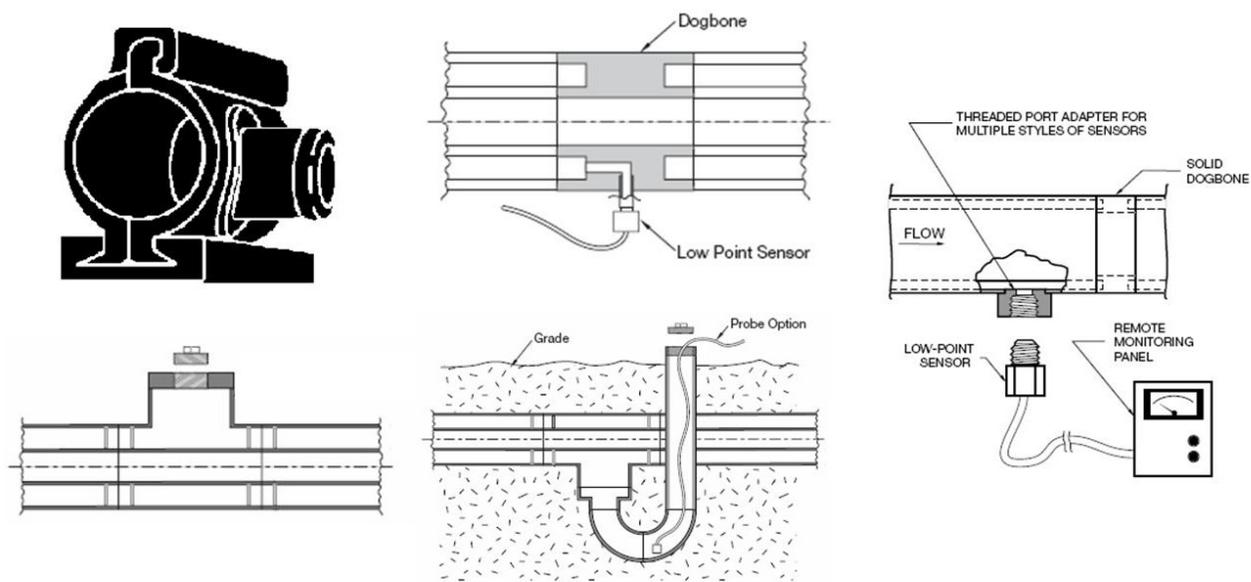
C. Schematics of leak detection arrangements for multi-walled piping systems. Top left: cartoon of a pipe section with a leak detection port protruding from the right; Top centre: attachment for a low point sensor; Bottom left: access tee; Bottom centre: inspection well; Far right: threaded port for single-point detection incorporated into straight piping.
